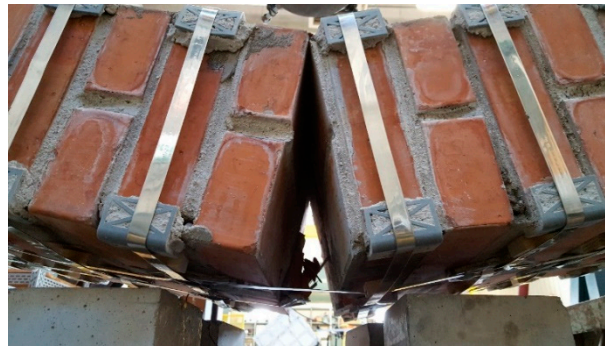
Arrangement of the flat steel bars on the central cross-section.
